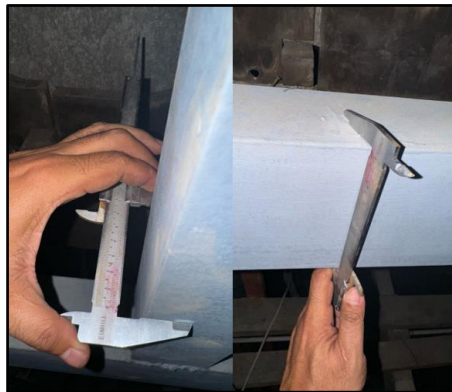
The size and dimensions of the steel truss frame adjust the existing conditions
